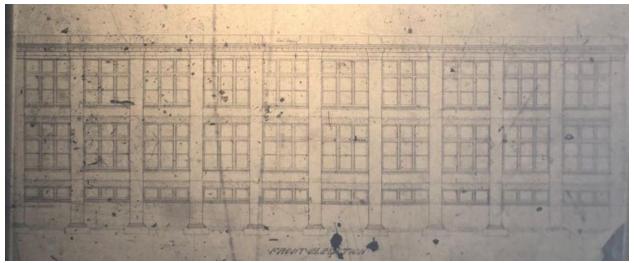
Architectural drawing (1910) of the side (Queen East Street) elevation of the New Method Laundry building. Original two-storey configuration and cornice shown.
